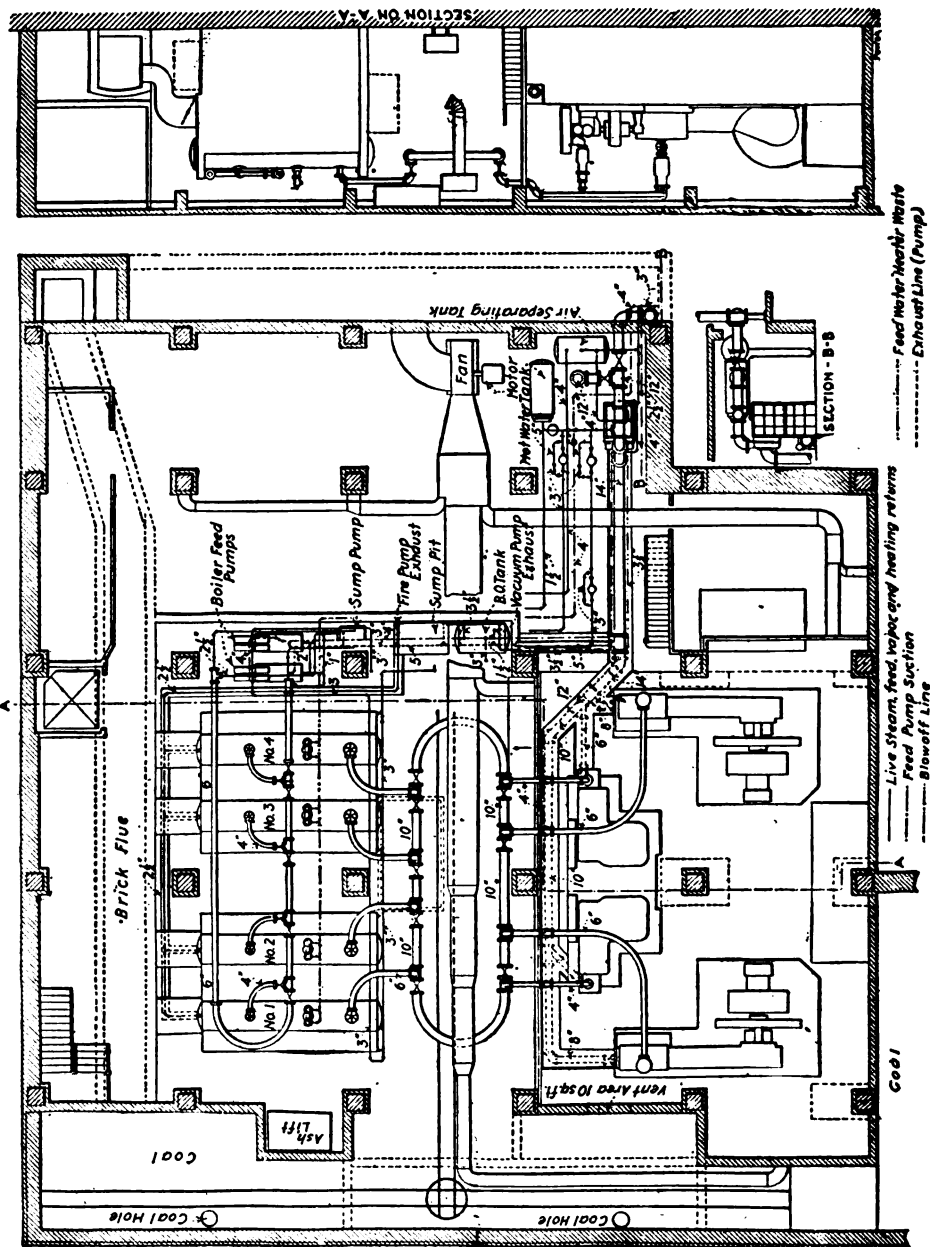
GENERAL PLAN, SHOWING LAYOUT OF PIPING FOR LOOP HEADER SYSTEM.
